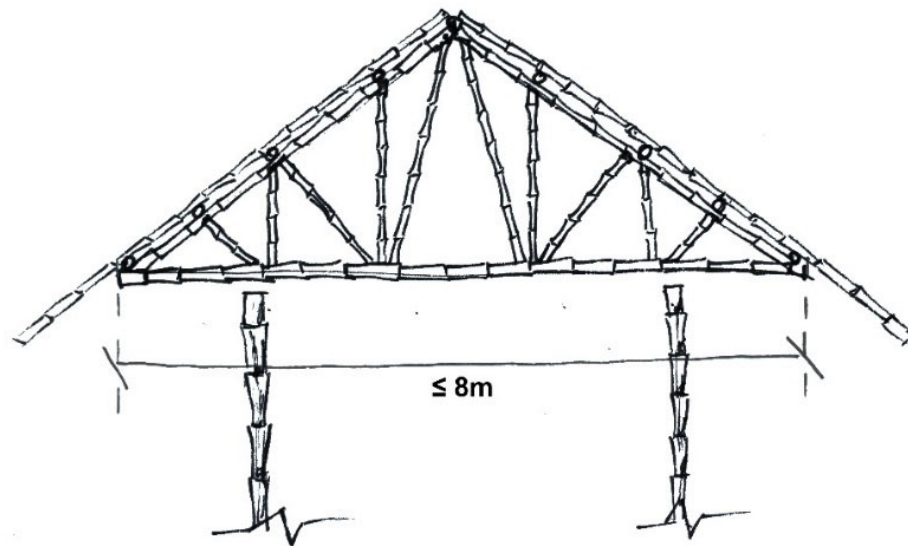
Planar truss spanning up to 8m. Sketch by author based on truss design referenced from Minke (2012, p. 51).
